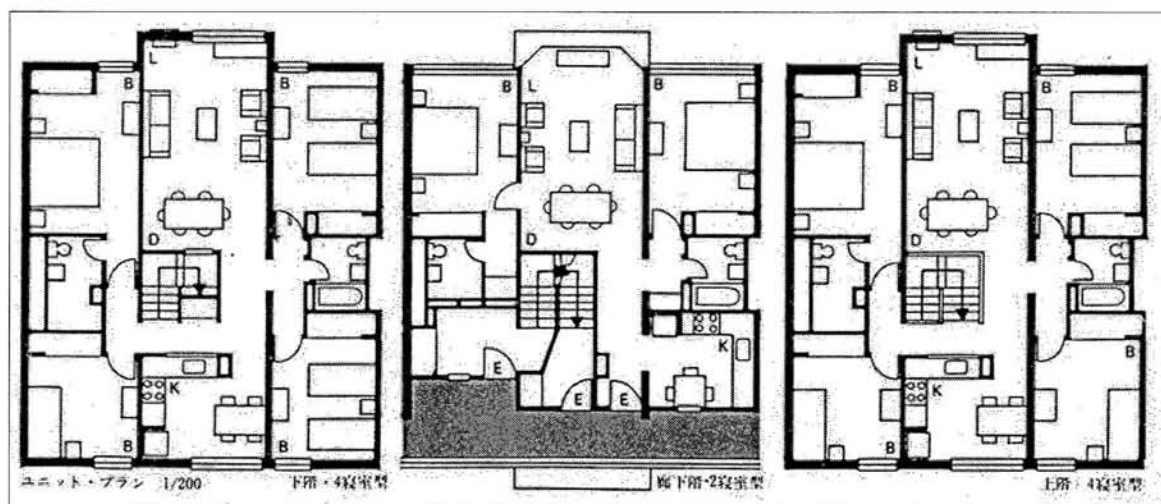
Eastwood, Floor Plans, Corridor Level Plan in Center
